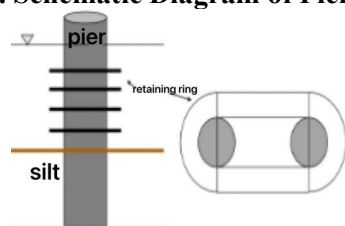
Schematic Diagram of Multi Ring Bridge Pier
